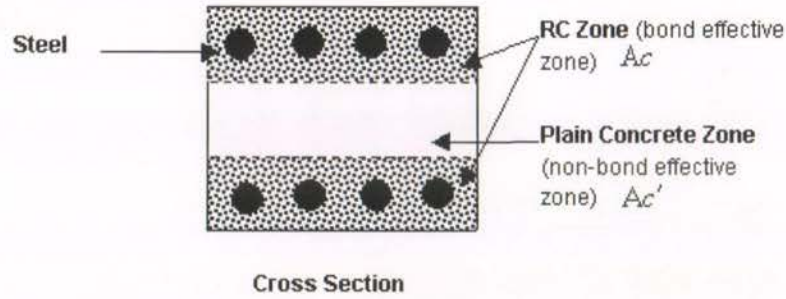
Bond affected zone in reinforced concrete elements (UC-win)
